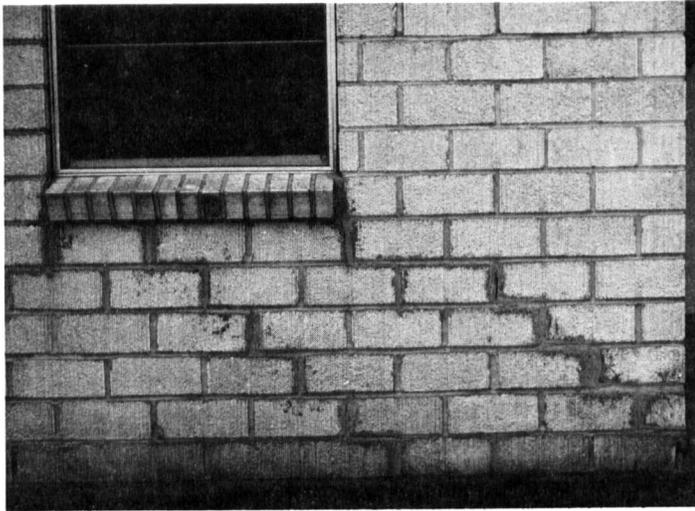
The foundation of this house failed and the walls cracked because the soil shrinks when dry and swells when wet. The soil is Oktibbeha clay, 3 to 8 percent slopes, eroded.
